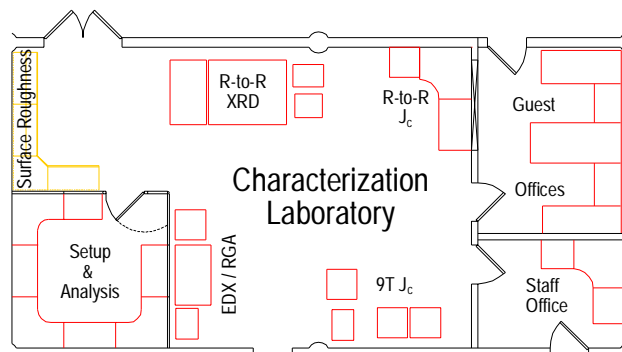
Floor plan of the ACCI Characterization Laboratory (~1000 ft²).
